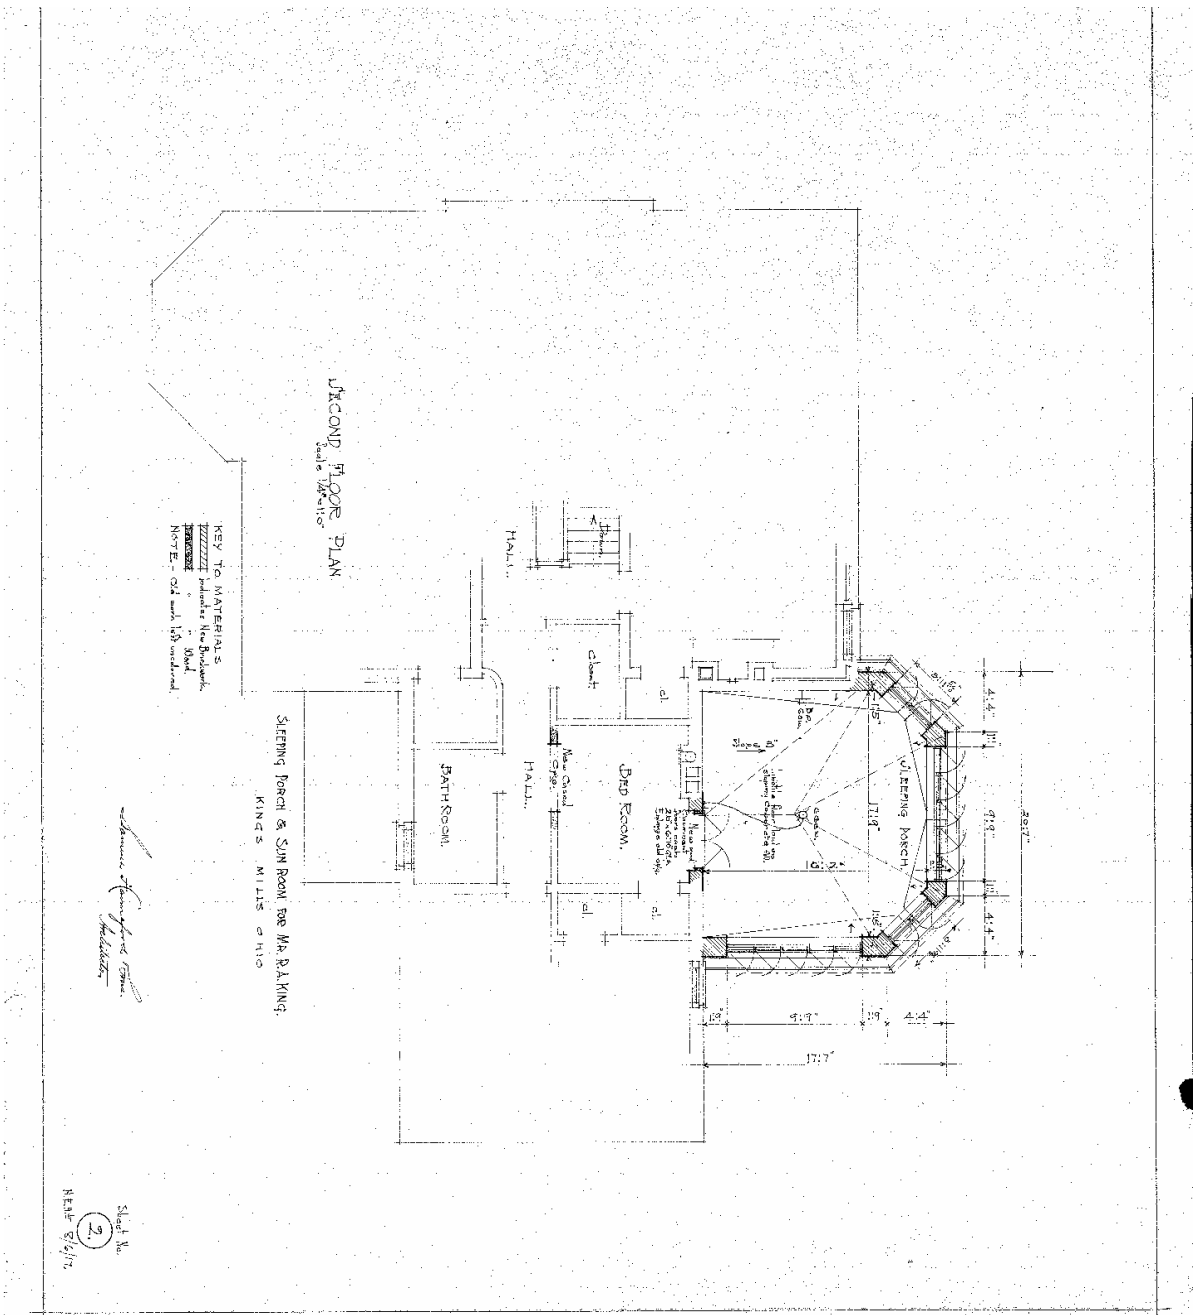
Second floor plan, "Sleeping Porch and Sun Room for Mr. R. A. King, Kings Mills, OH," Samuel Hannaford & Sons, August 16, 1917
